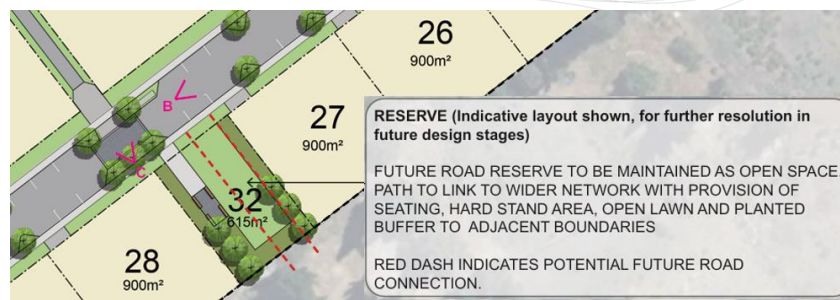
Studio 3 Excerpt from Master Plan illustrating open space within the Lot 32 road stub
